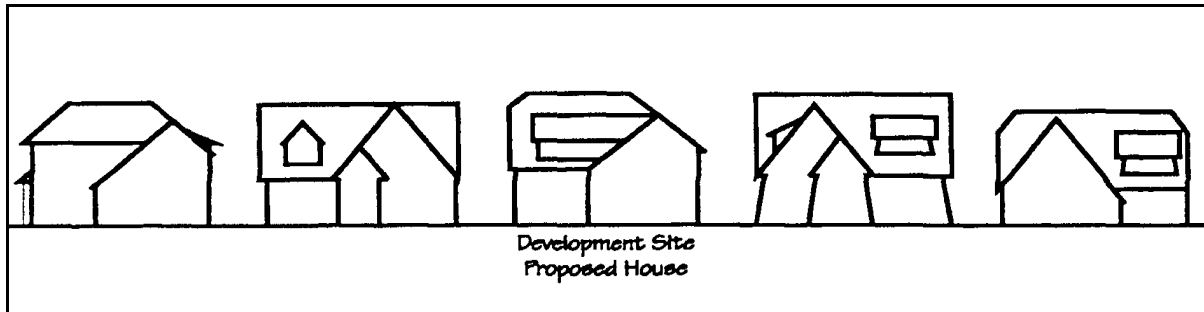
Streetscape Example (1) Showing Primary and Secondary Building Forms
